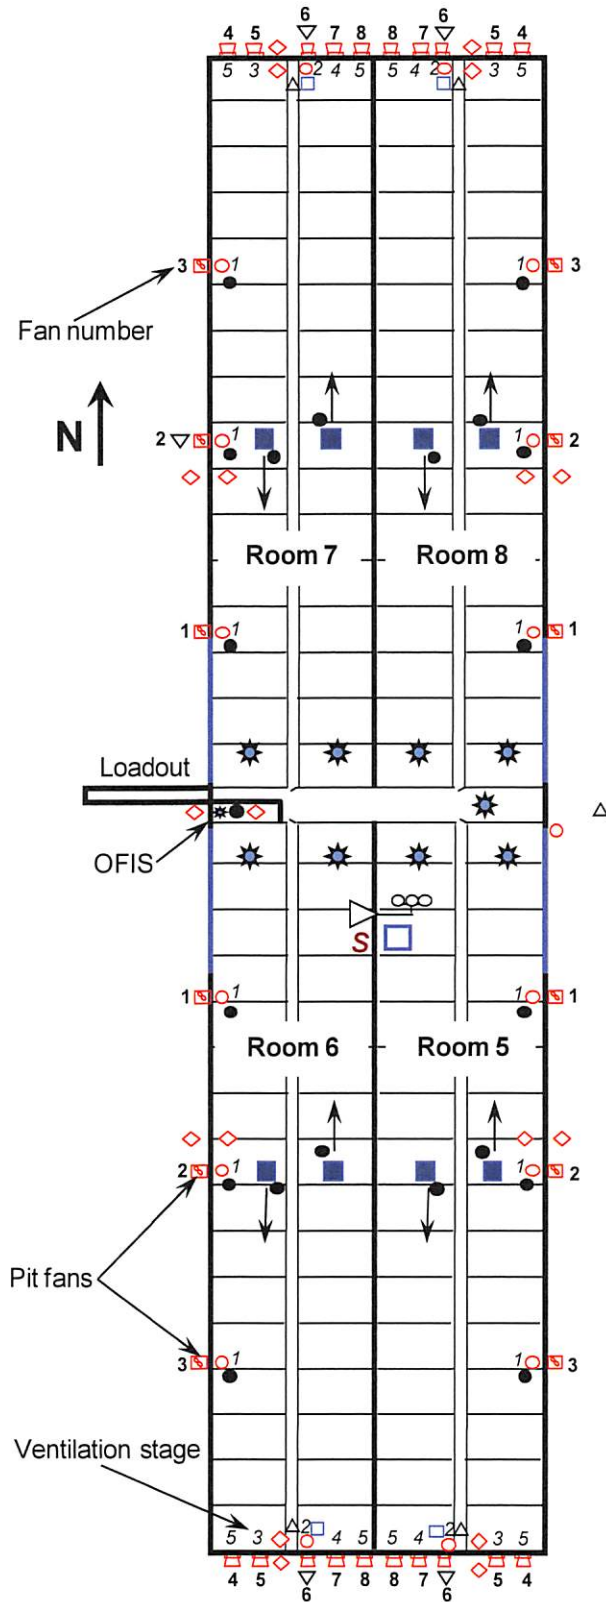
Floor plan of the barns, showing the sampling and measurement locations for barn 2 (rooms 5 to 8).
